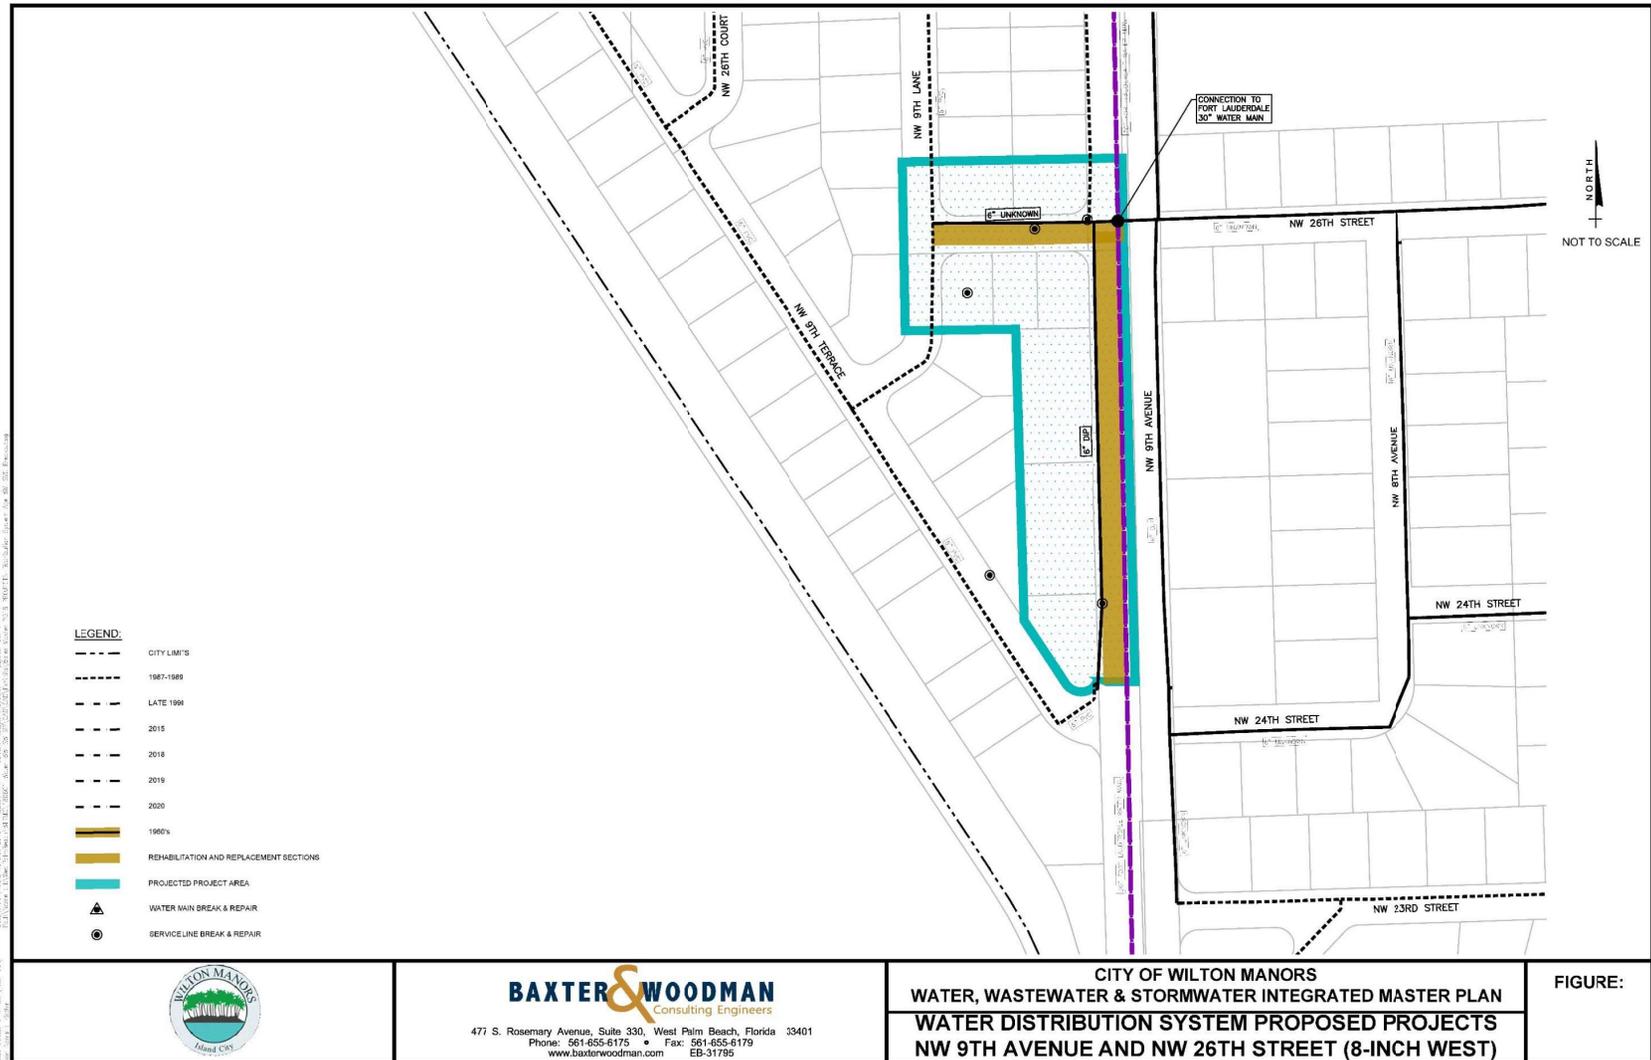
Project #5 – NW 9th Avenue & NW 26th Street Water Main Replacement
